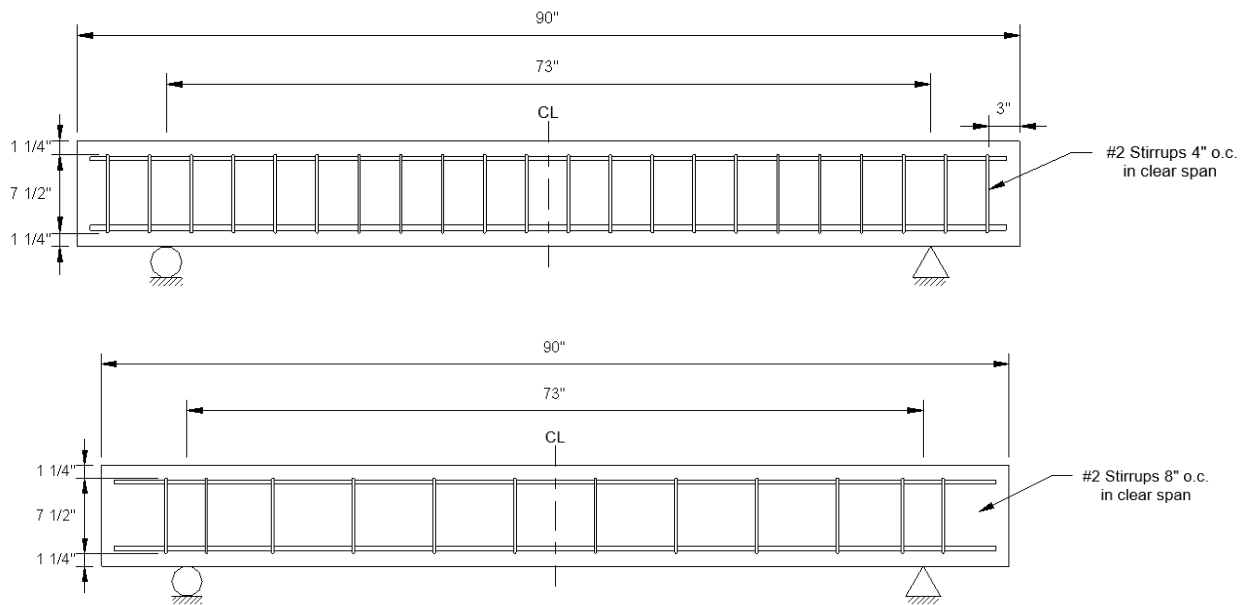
Images. Longitudinal cross sections of laboratory-scale beams.
